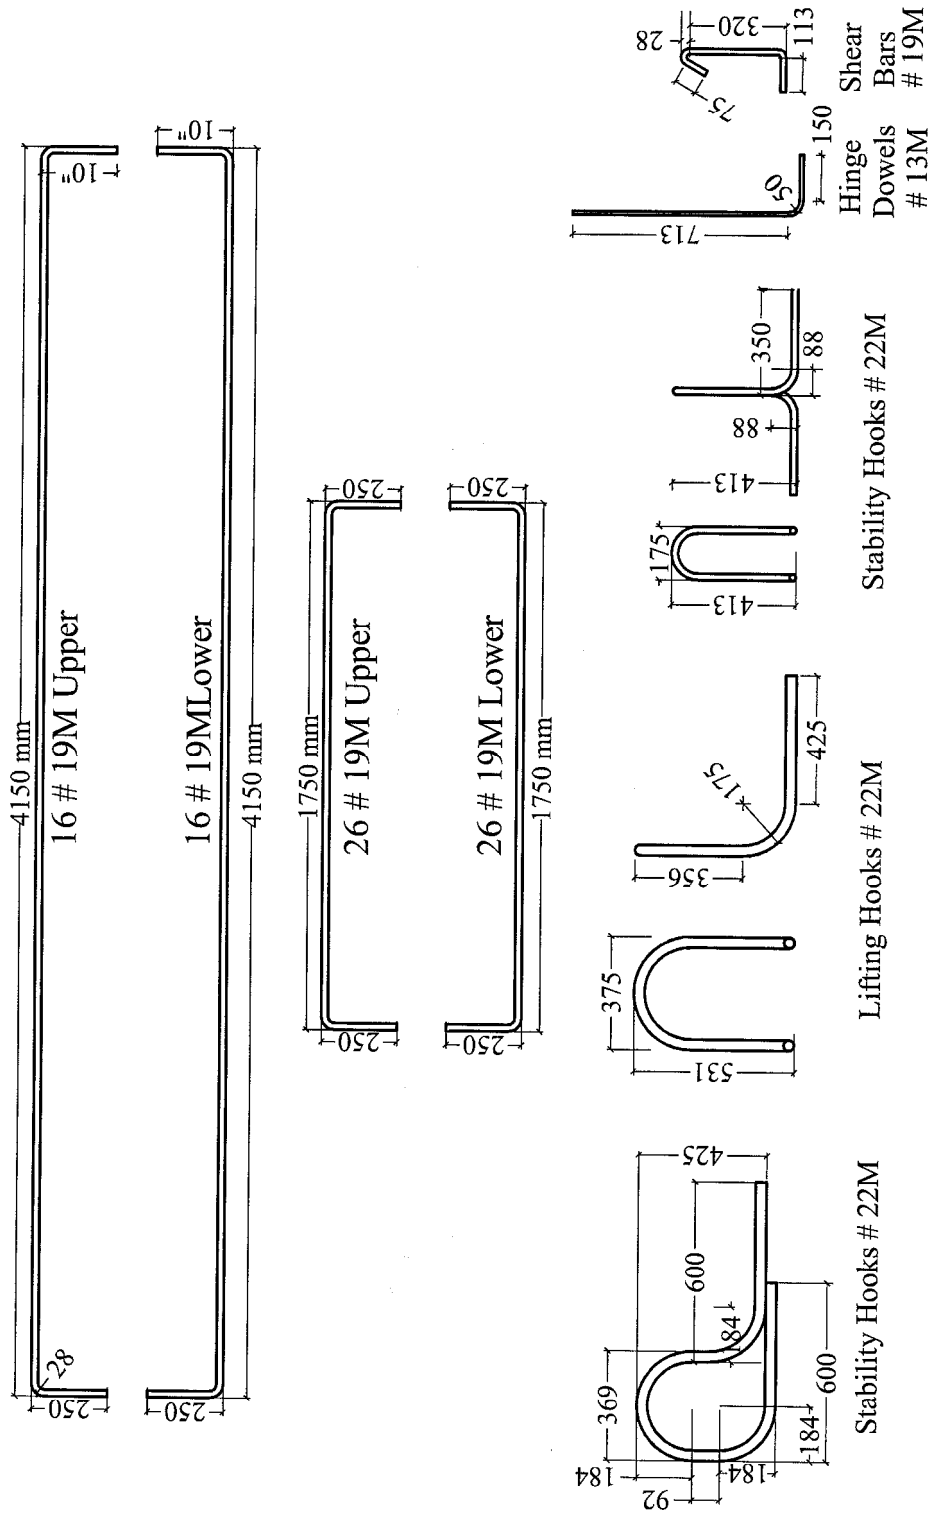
Details of Footing Reinforcement for All Specimens (SI Units)
